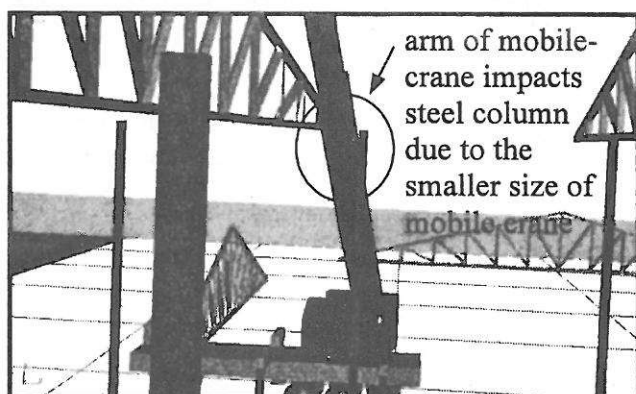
Dangerous event: installation of all columns and then the roof-truss
